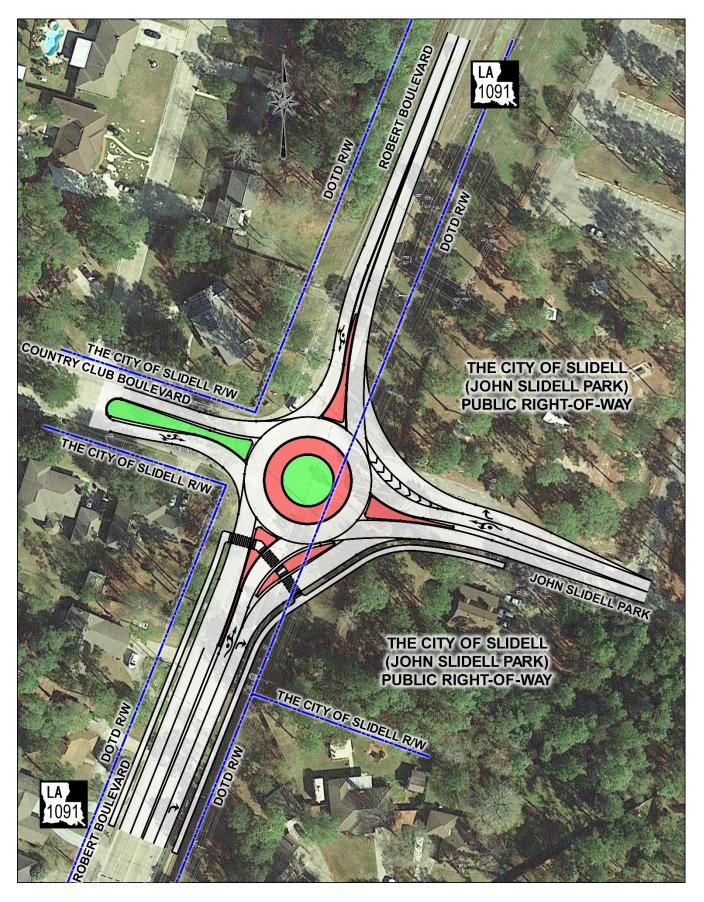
CONCEPTUAL ROUNDABOUT LAYOUT DESIGN
